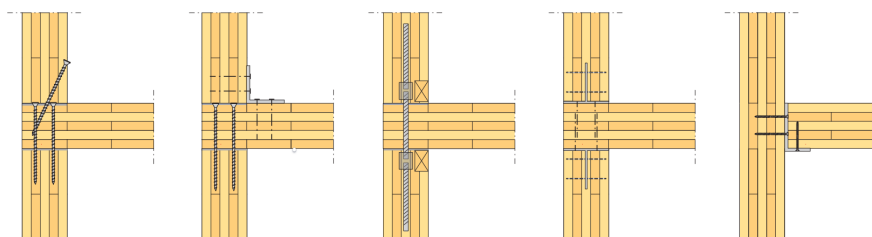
Examples of slab to wall connection (Swedish Wood, 2019).
